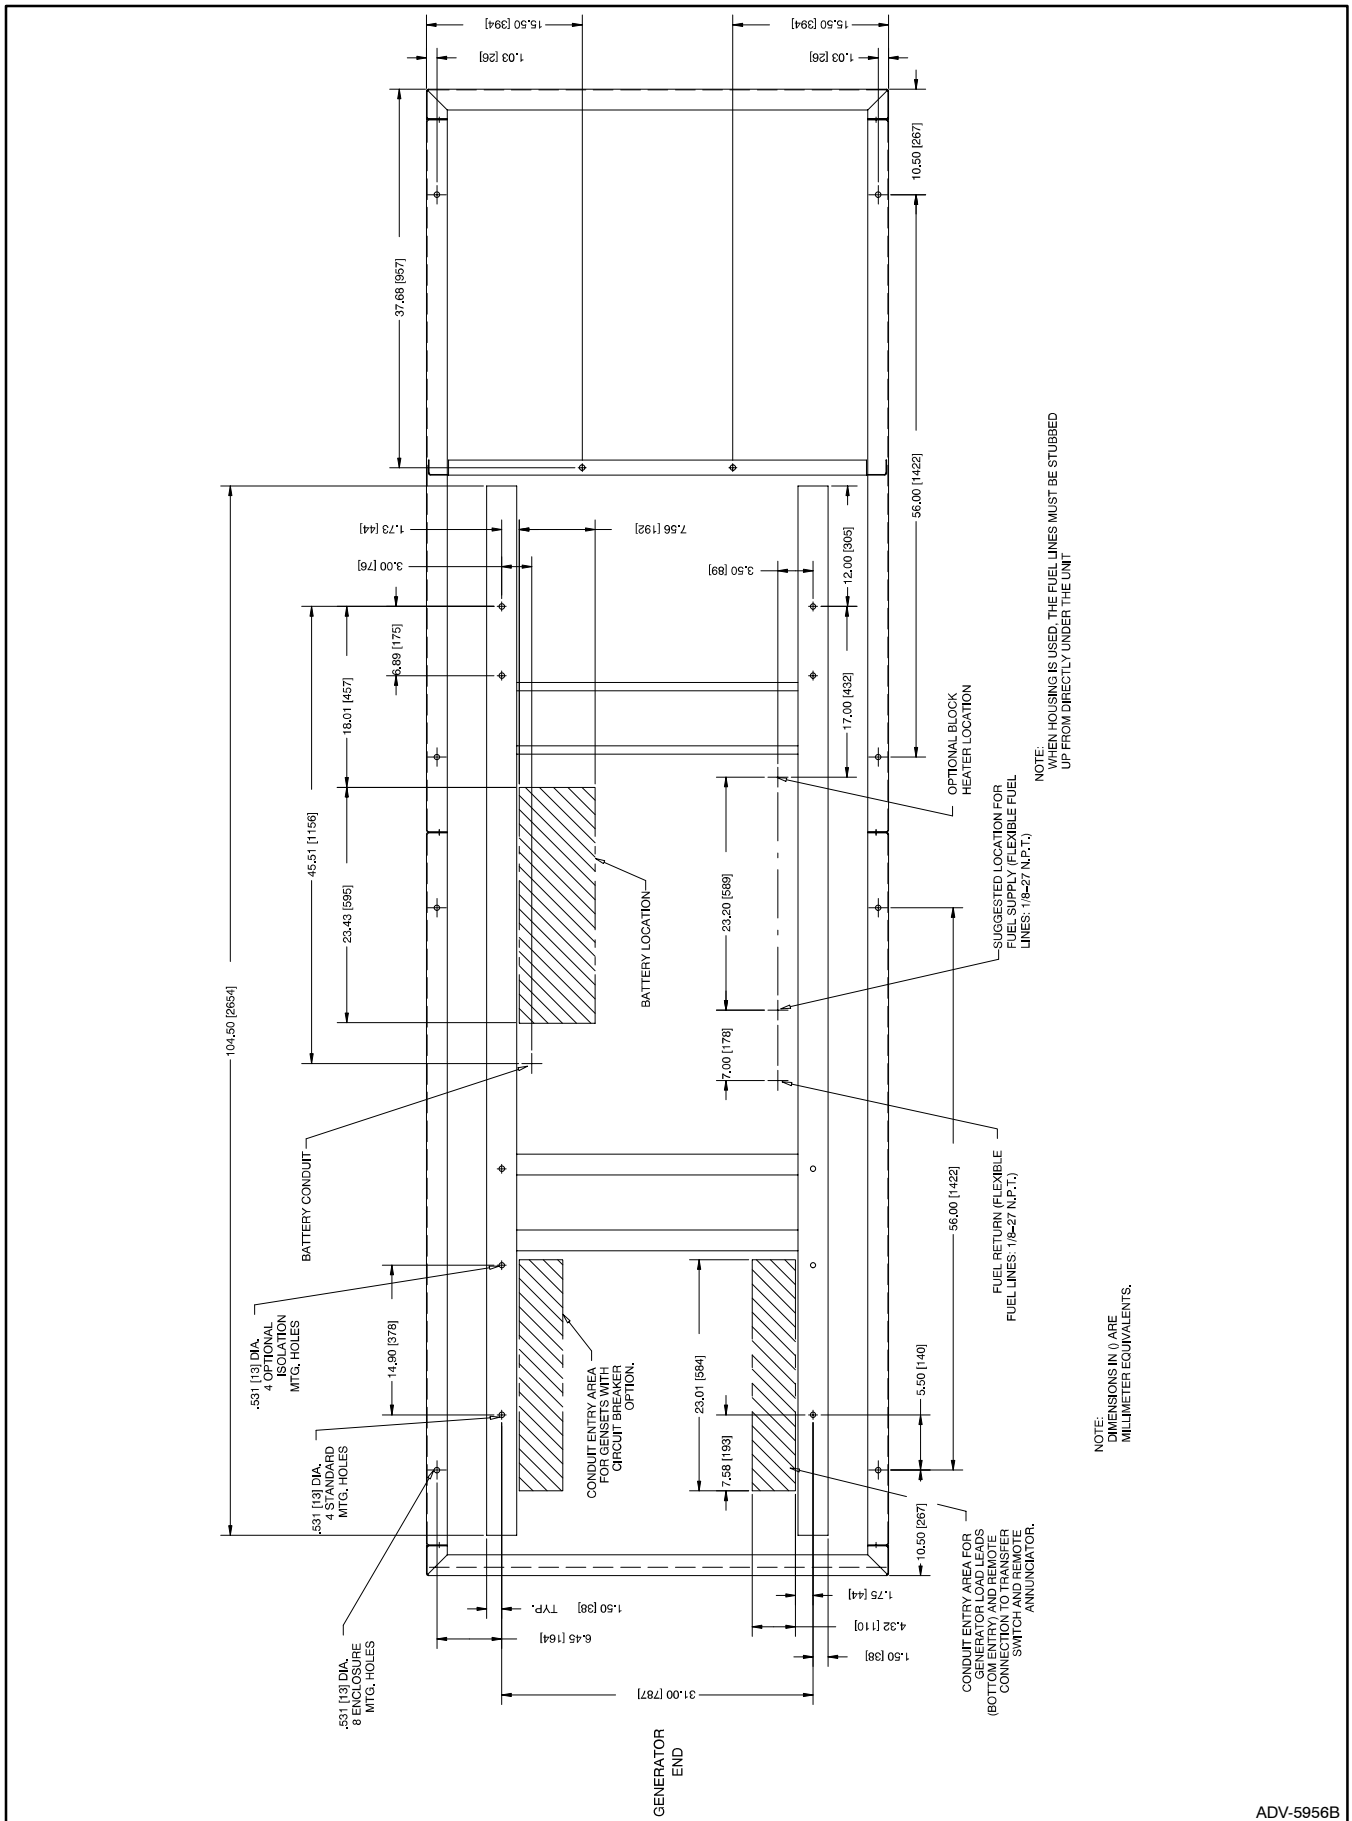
Sound Shield Enclosure Generator Floor Mounting Plan
